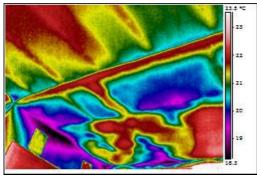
Ground floor room showing thermal anomalies on the ceiling which is potentially due to poor insulation of the pitched roof above the windows
